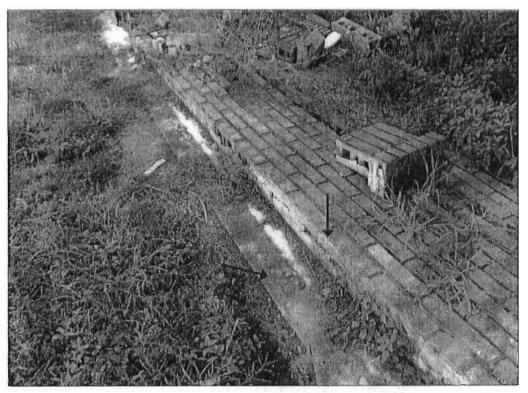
Collapsed section of privacy wall where base course of masonry (right arrow) separated from concrete footing (left arrow).
